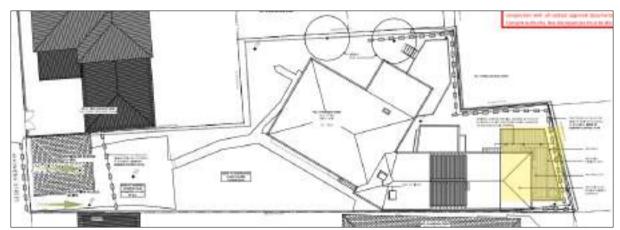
Approved Roof Plan in DA300/19/2 showing skylight retained.
